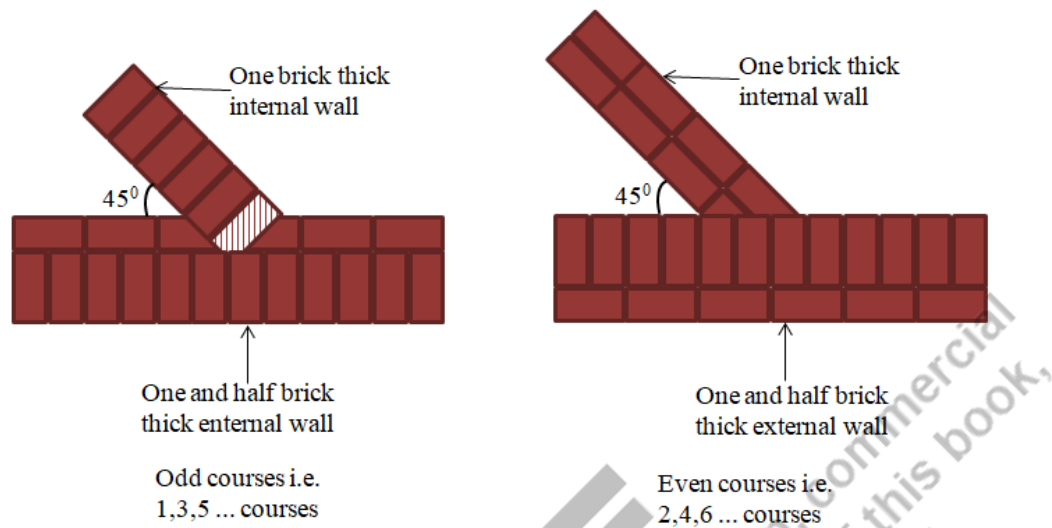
(a) Squint junction between one brick thick wall and one and a half brick thick wall
